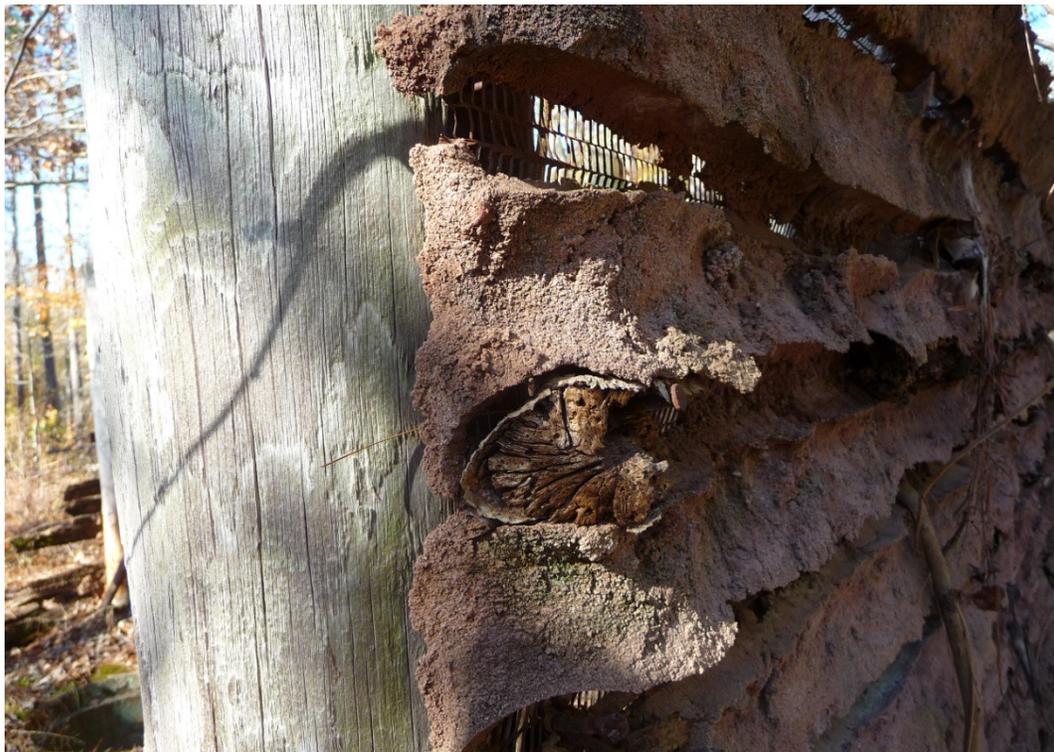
Showing tunnel entrance inside hut at West Village site, Fort Gordon, GA (ERDC-CERL, 2014).
